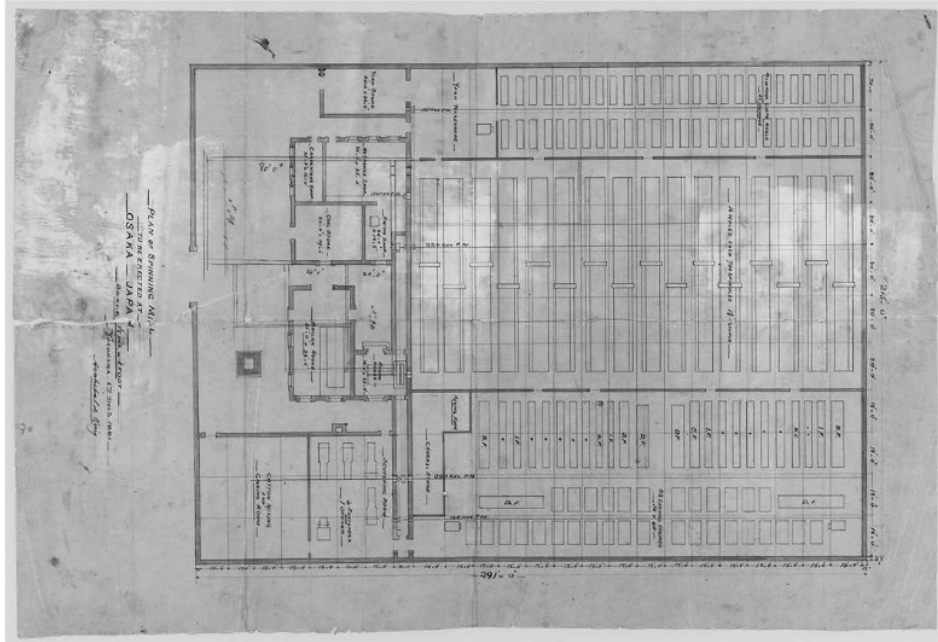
Machinery layout plan, Mill No. 1 at Osaka Bōseki [2-03]
